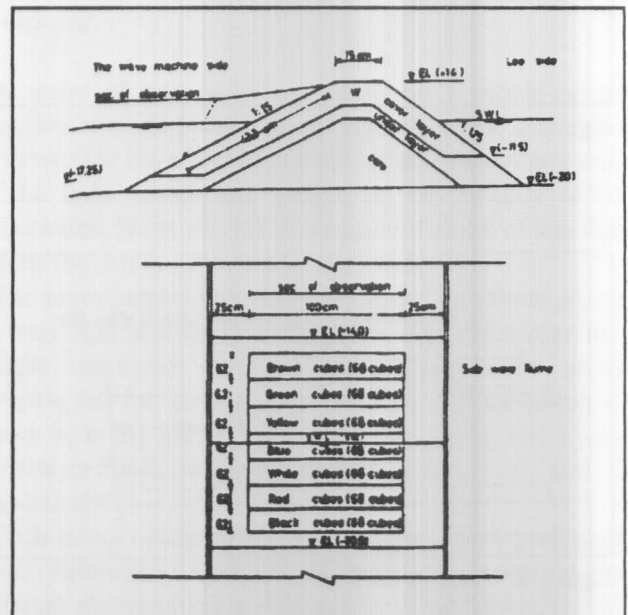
Cross section of the breakwater model and details of the observation area (For slope 1:1.5).
